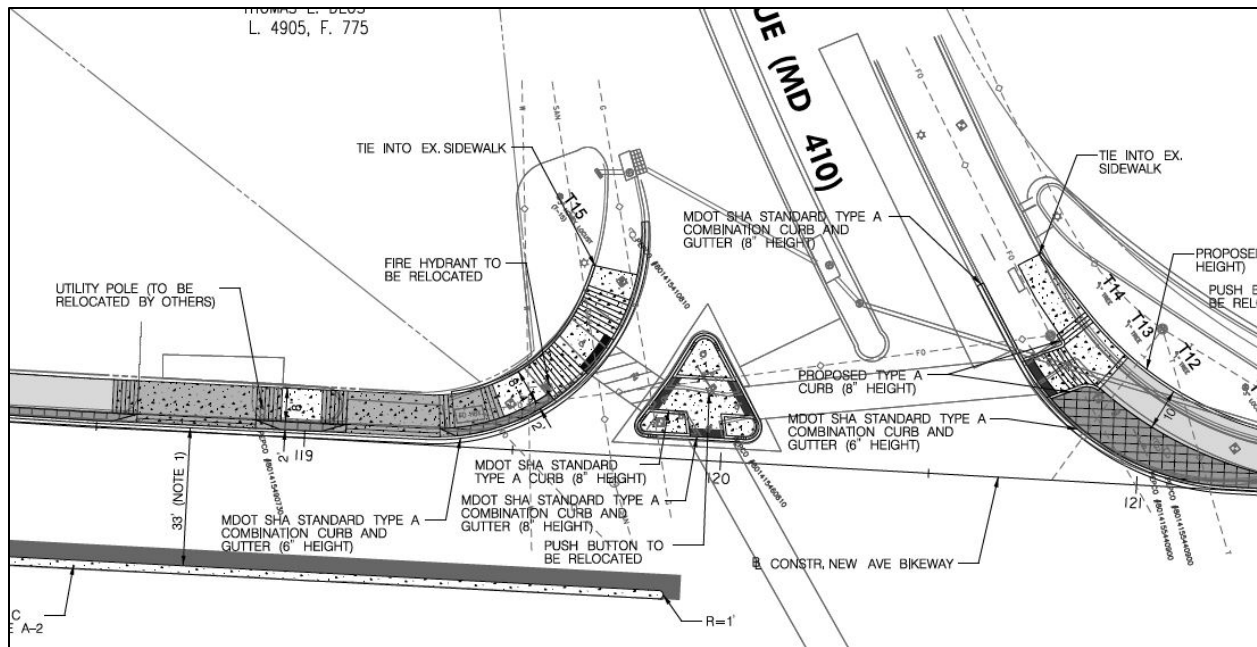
New Ave Bikeway at Auburn Avenue – Proposed Modifications
